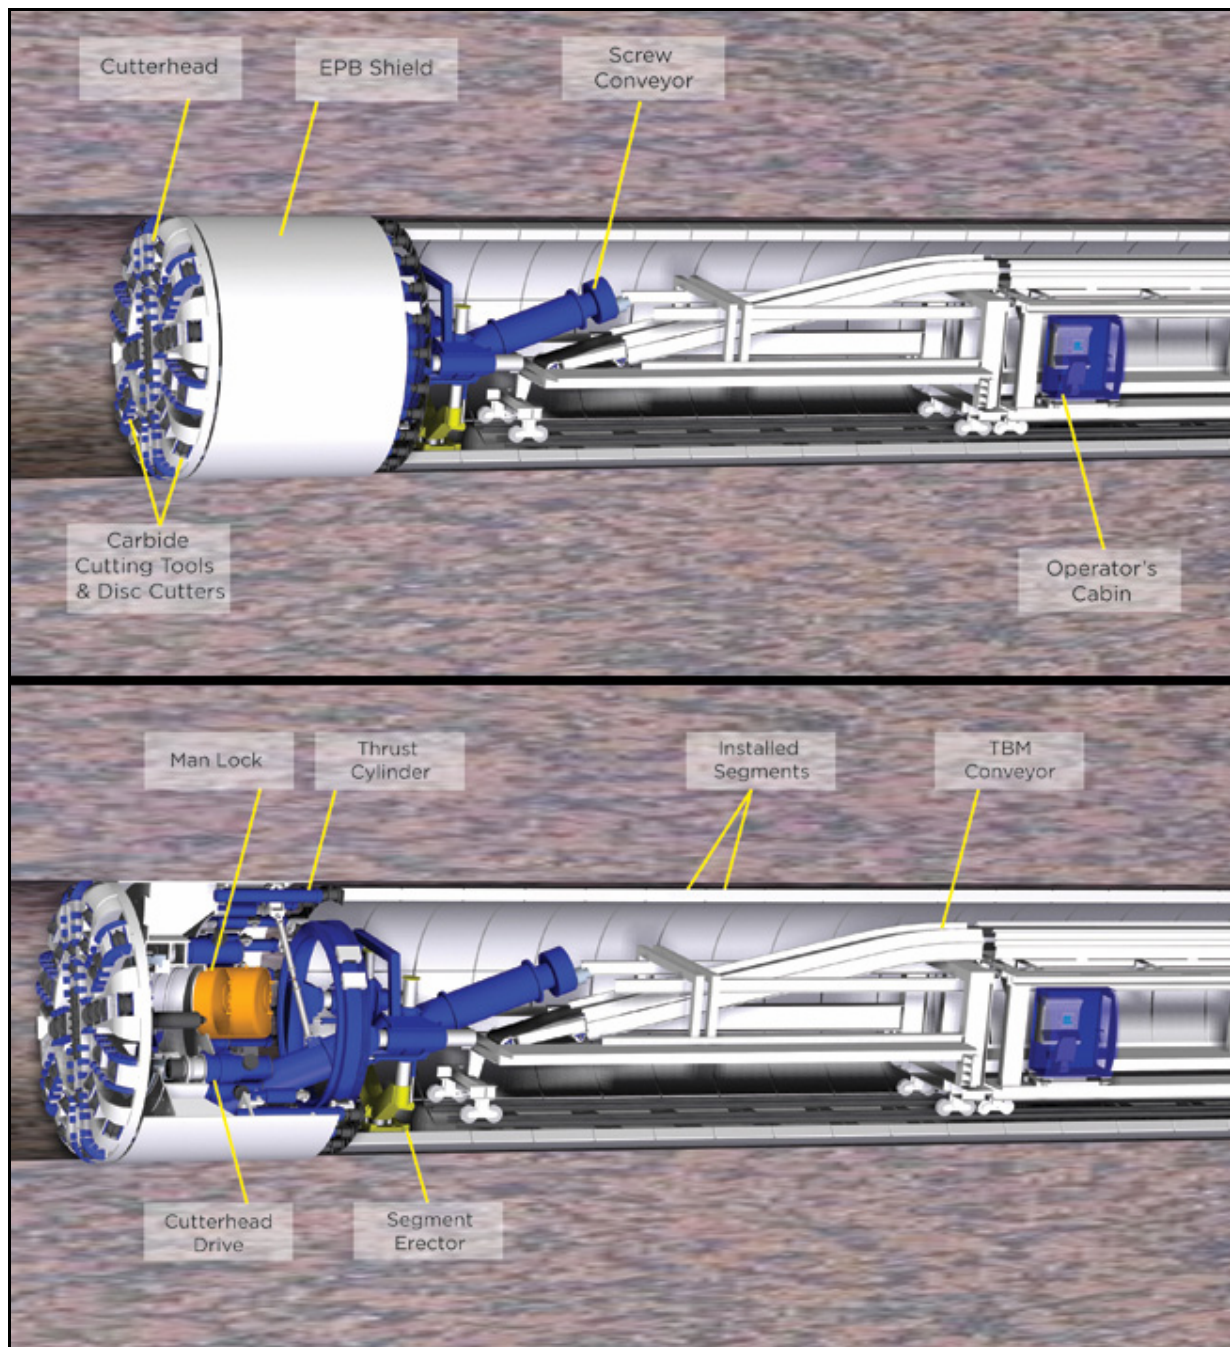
Typical Tunnel Boring Machine (source Robbins)
